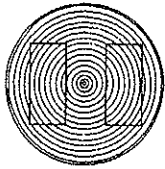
Sawing pattern of interaction test specimens (80/160 mm).
